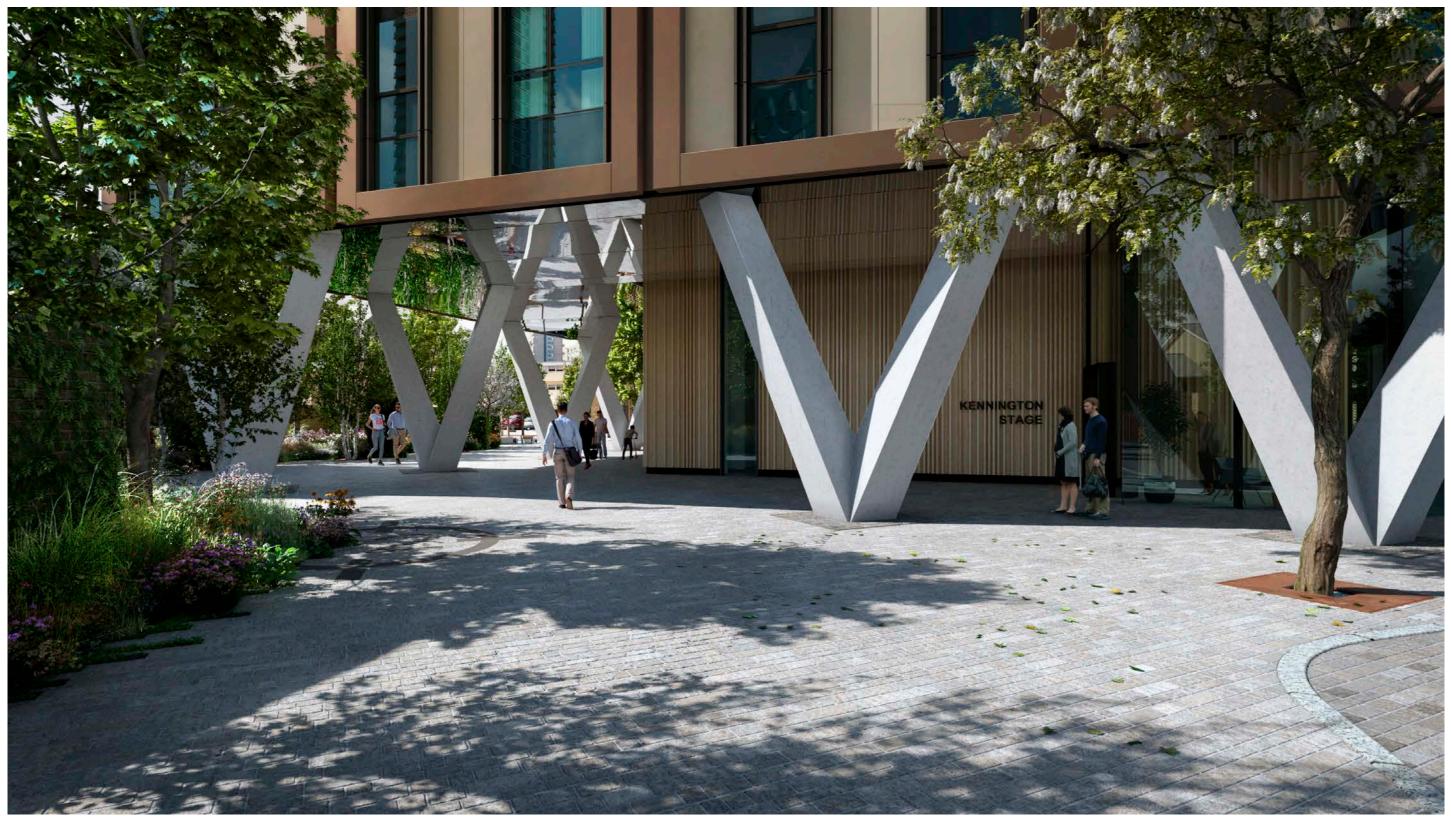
View looking underneath the covered walkway along the public route arriving from Longville Road leading towards Dugard Way
